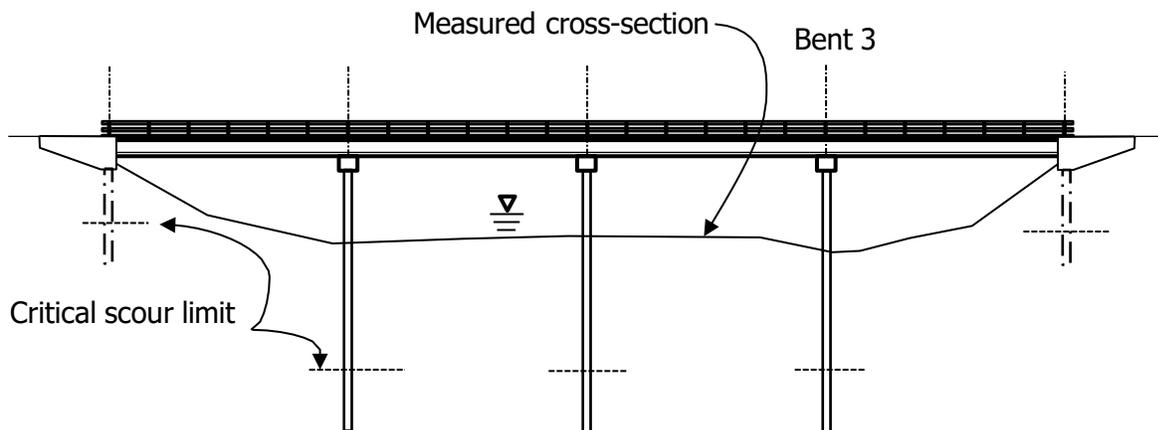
Elevation view showing scour elevations and stream cross-section for a bridge.
